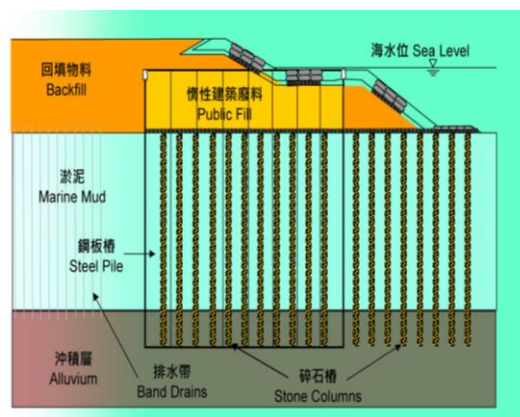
Typical Section of Fully Non-dredged Reclamation Seawall
